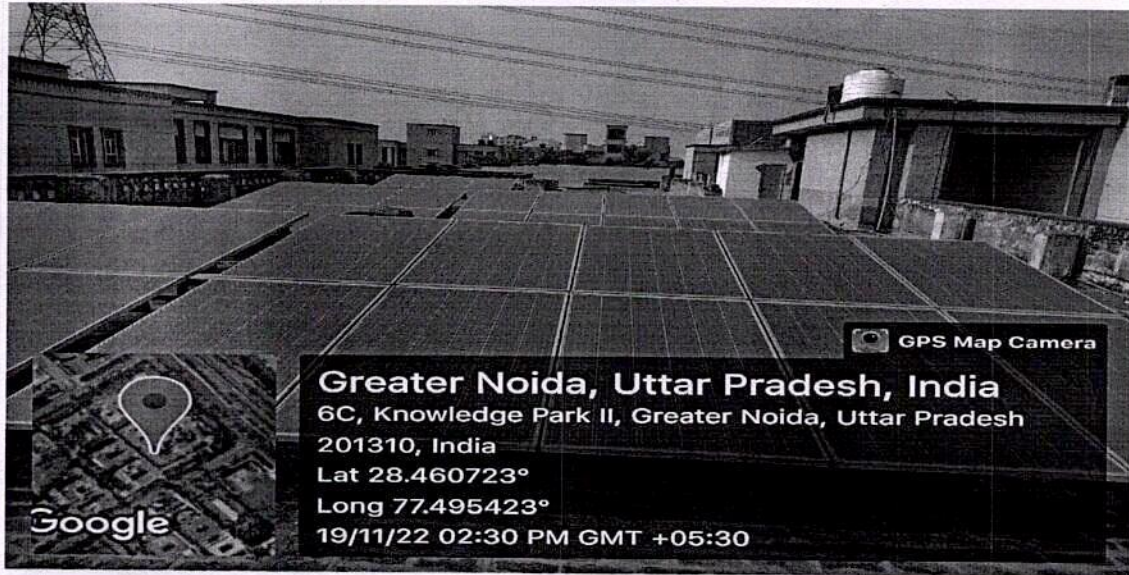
Roof top Solar panel 4 on main campus towards main ground
